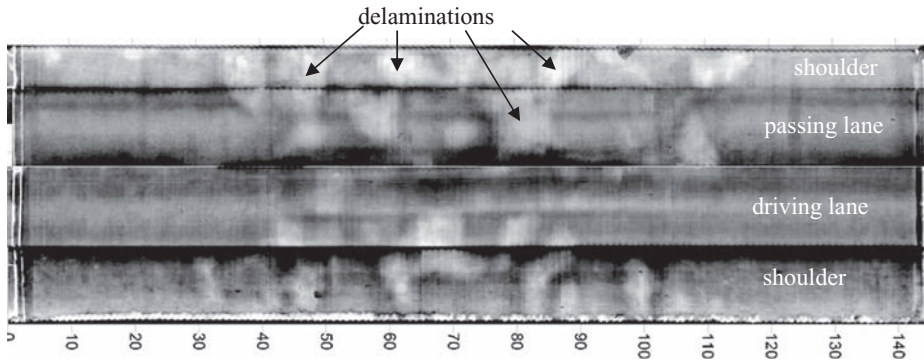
Sample IR deck image showing >10% debonding and delamination.
